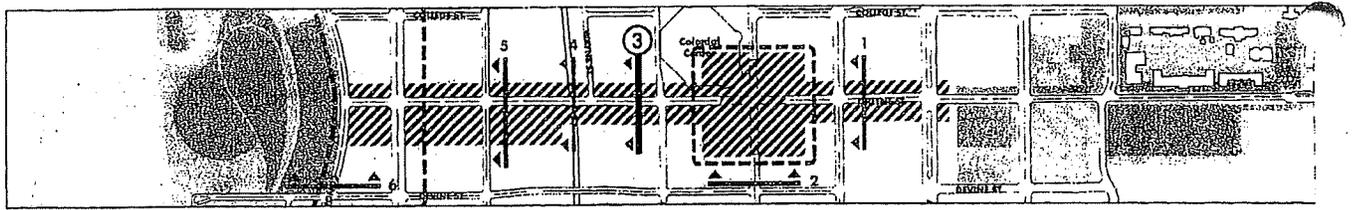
SECTION 3: GREENE STREET AT THE ENTRY TO THE BRIDGE
